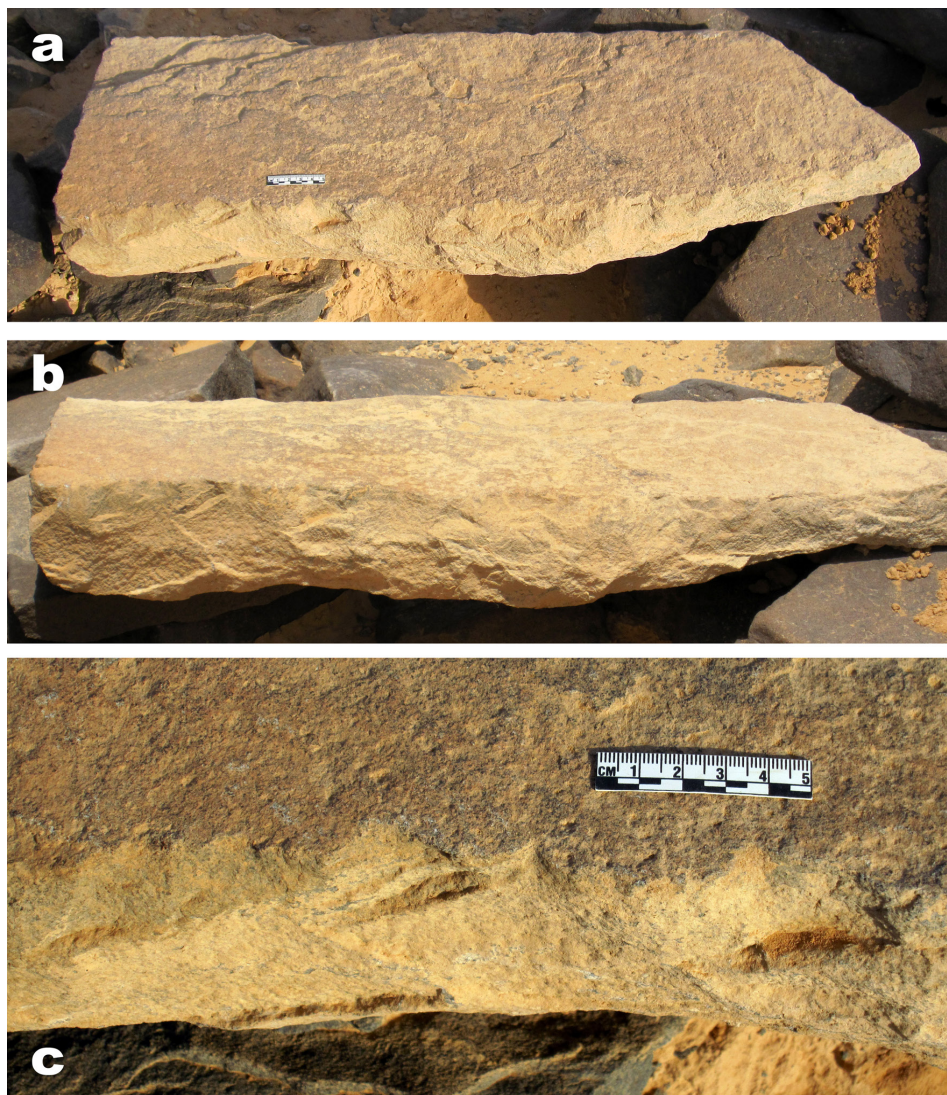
Possible pillar to support the corbelled roof: (a) Oblique view, (b) Horizontal view clearly showing edge shaping, (c) Detail of chipping. (Photo: G. Rollefson).
